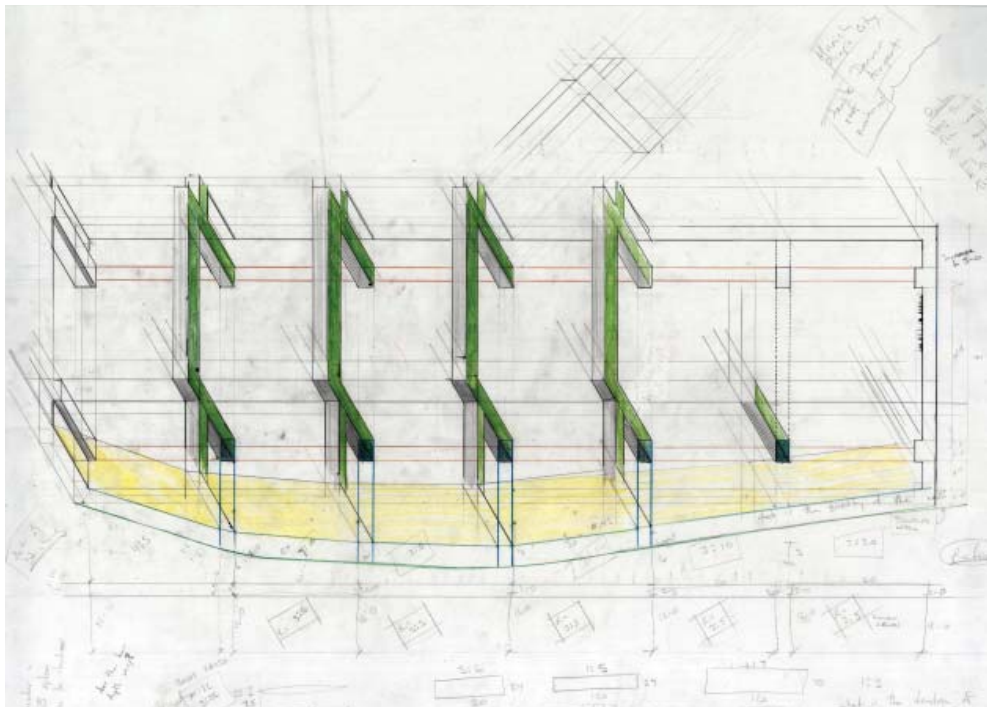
Preliminary Plan and Section. Pencil on Tracing Paper
